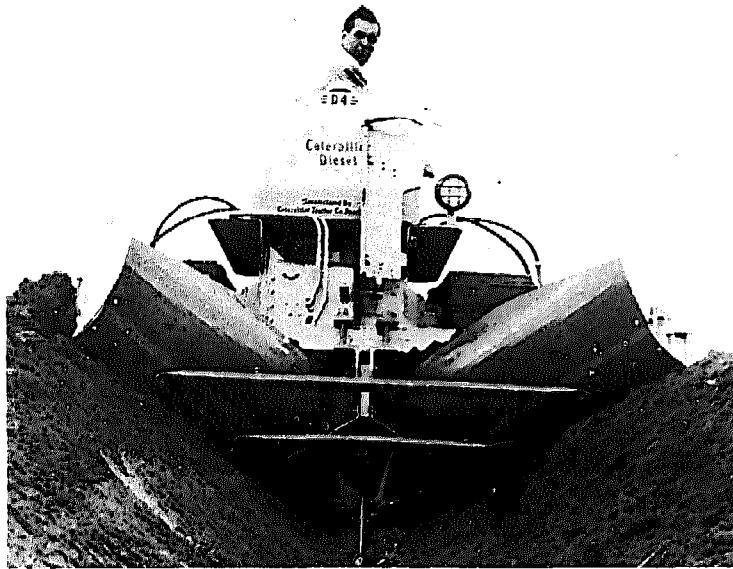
V-ditcher mounted on the tool bar of a crawler tractor.
